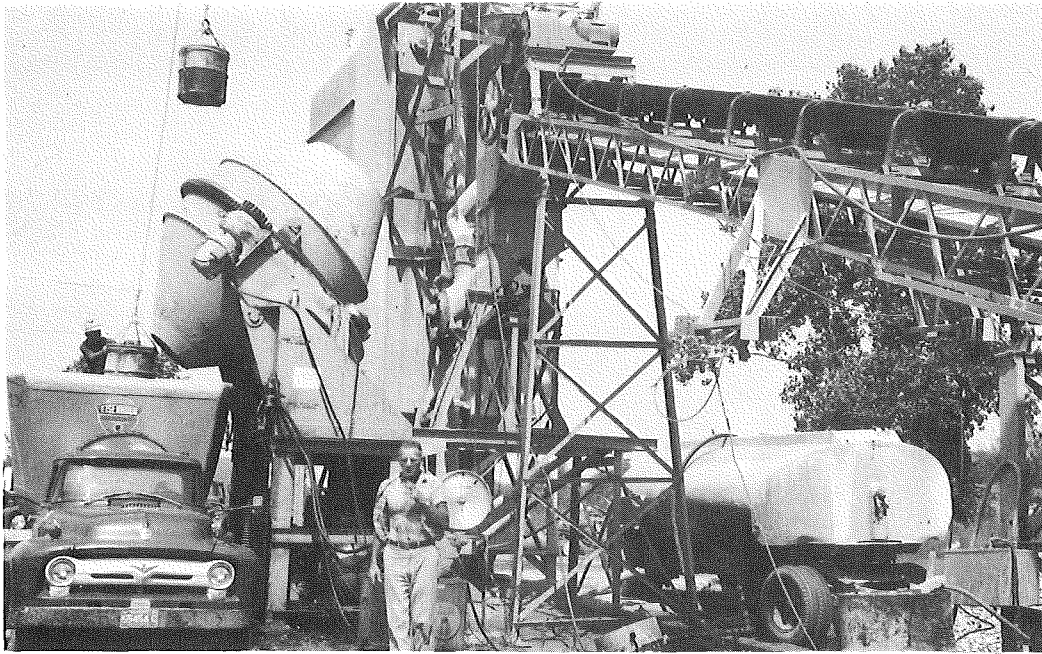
Manipulation of testing batch hopper, tilted mixer, and cement dial scale.
